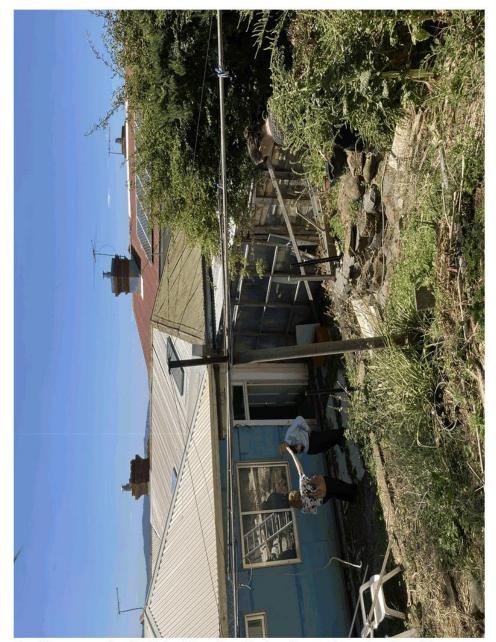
proposed wall which will be altered to form the southern elevation of the rumpus room. This proposed brick wall and privacy screen will sit a further 1m above the existing party wall (shown and capped in aluminium)
